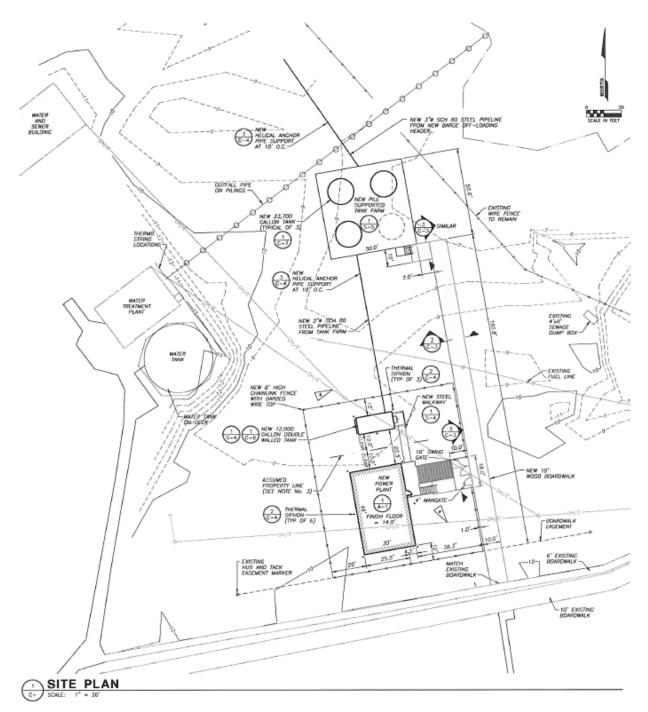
Kwigillingok Powerhouse Bulk Fuel Facility Site Plan
